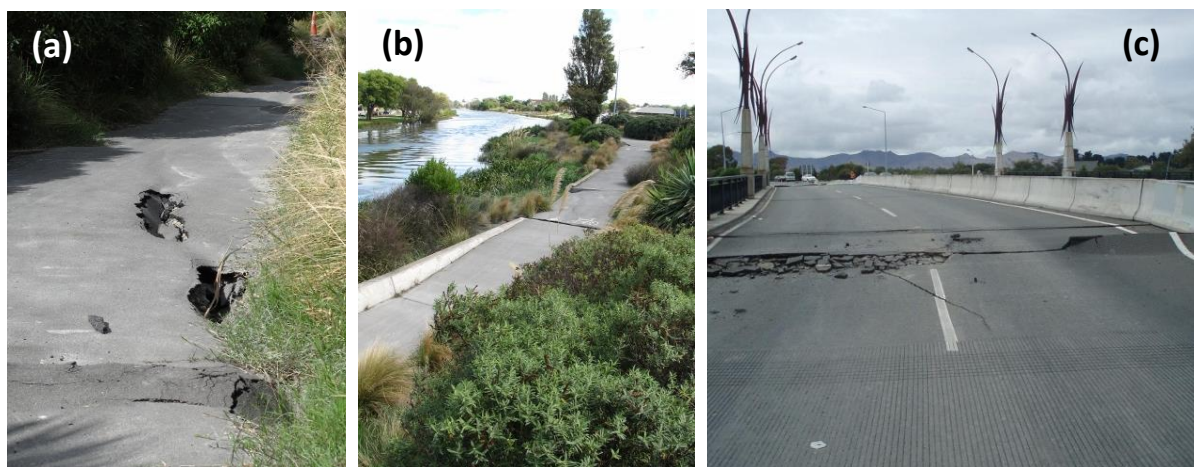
Pavement damage and ground settlement, northern abutment, ANZAC Bridge, (a) liquefaction damage in footpath immediately to the west of abutment, (b) footpath damage, photo taken from bridge looking west, (c) compression pavement damage at approach/deck interface
